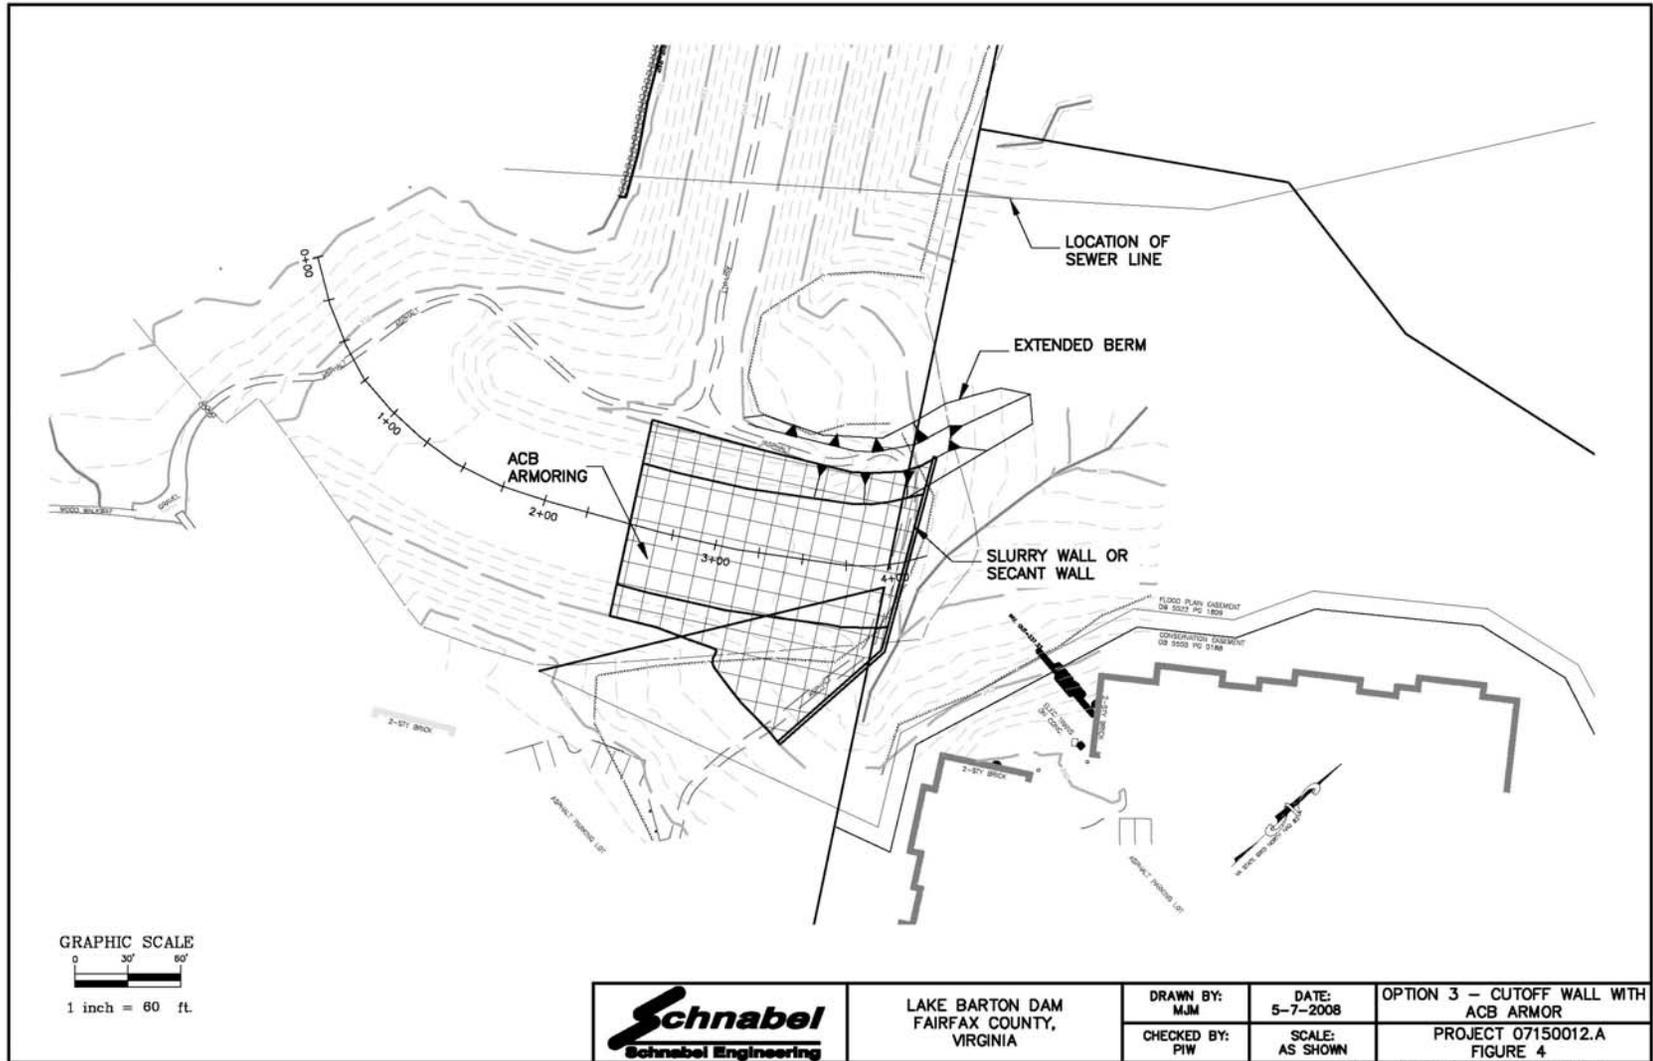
Option 3 Plan View - One Cutoff Wall with ACB Armor
